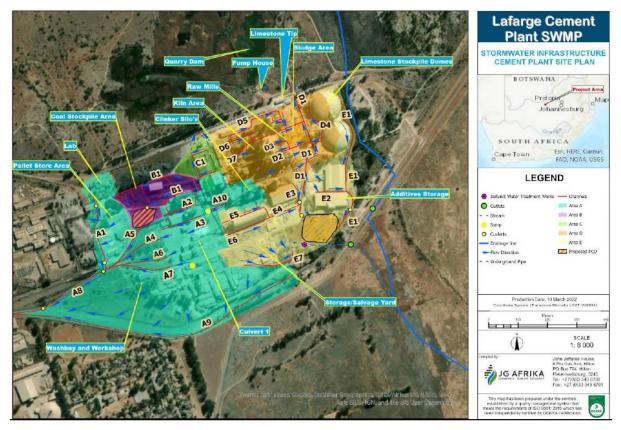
Lafarge Lichtenburg Cement Plant Proposed Stormwater Management Infrastructure Pollution Control Dam (PCD's)
